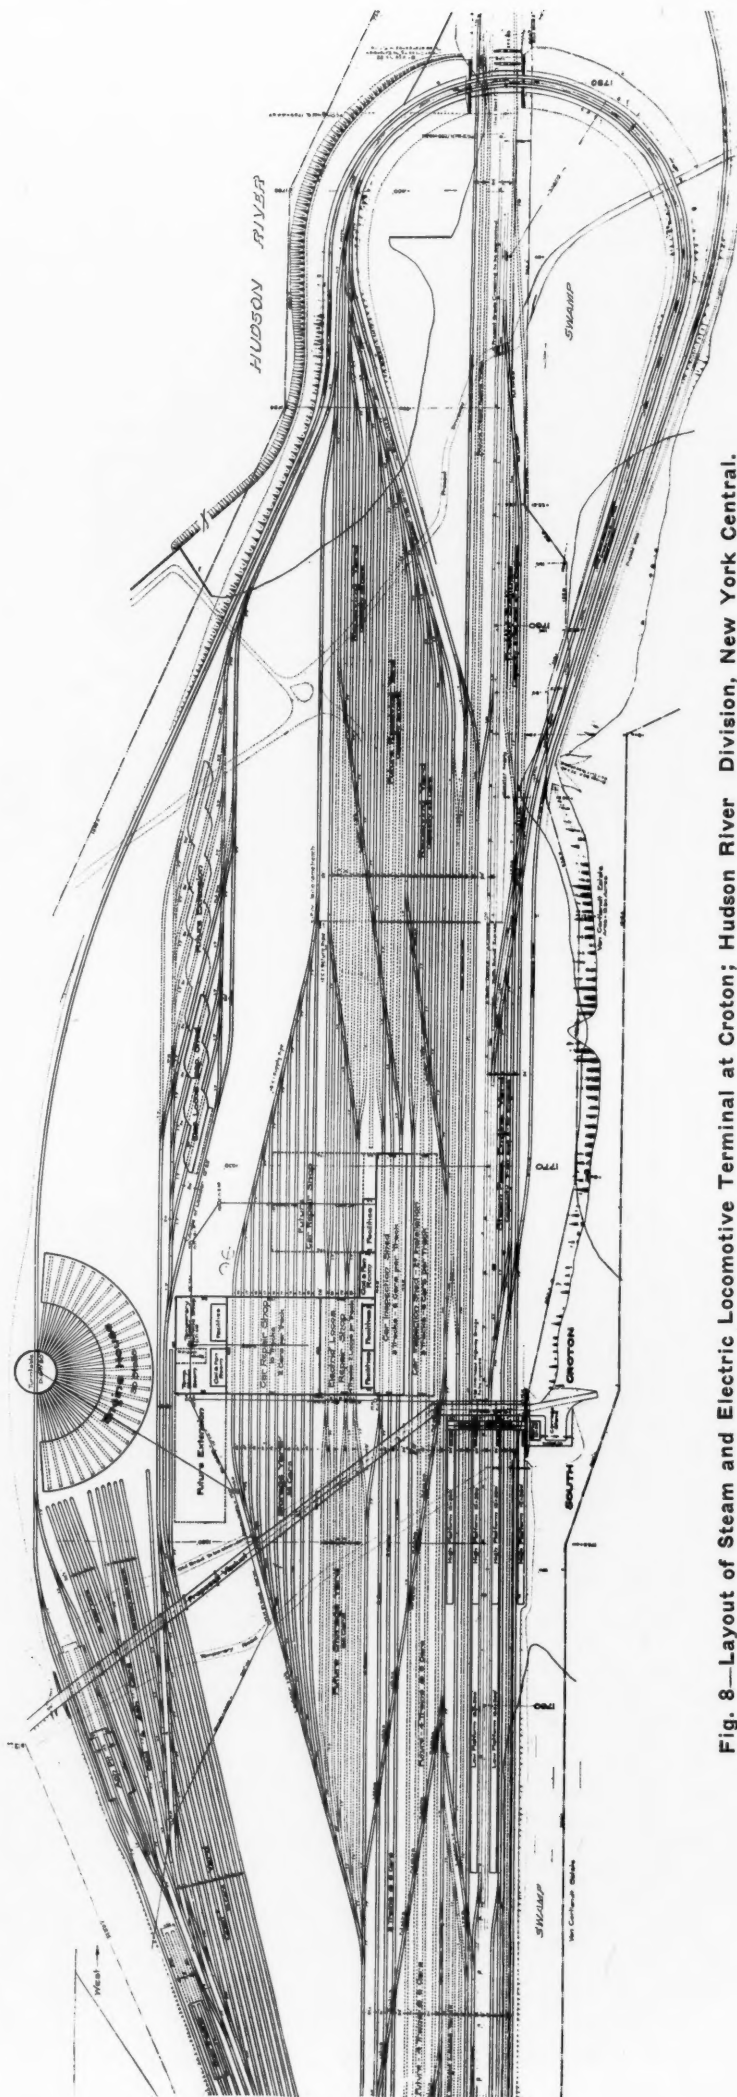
Layout of Steam and Electric Locomotive Terminal at Croton; Hudson River Division, New York Central.
